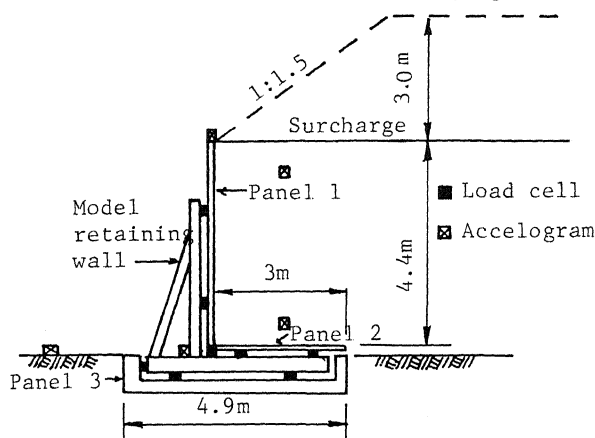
Model retaining wall with panel earth pressure gauges and accelograms
